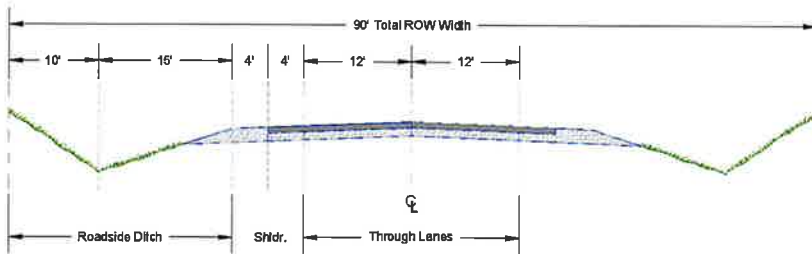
Typical Rural Minor Arterial Partial Cross Section
